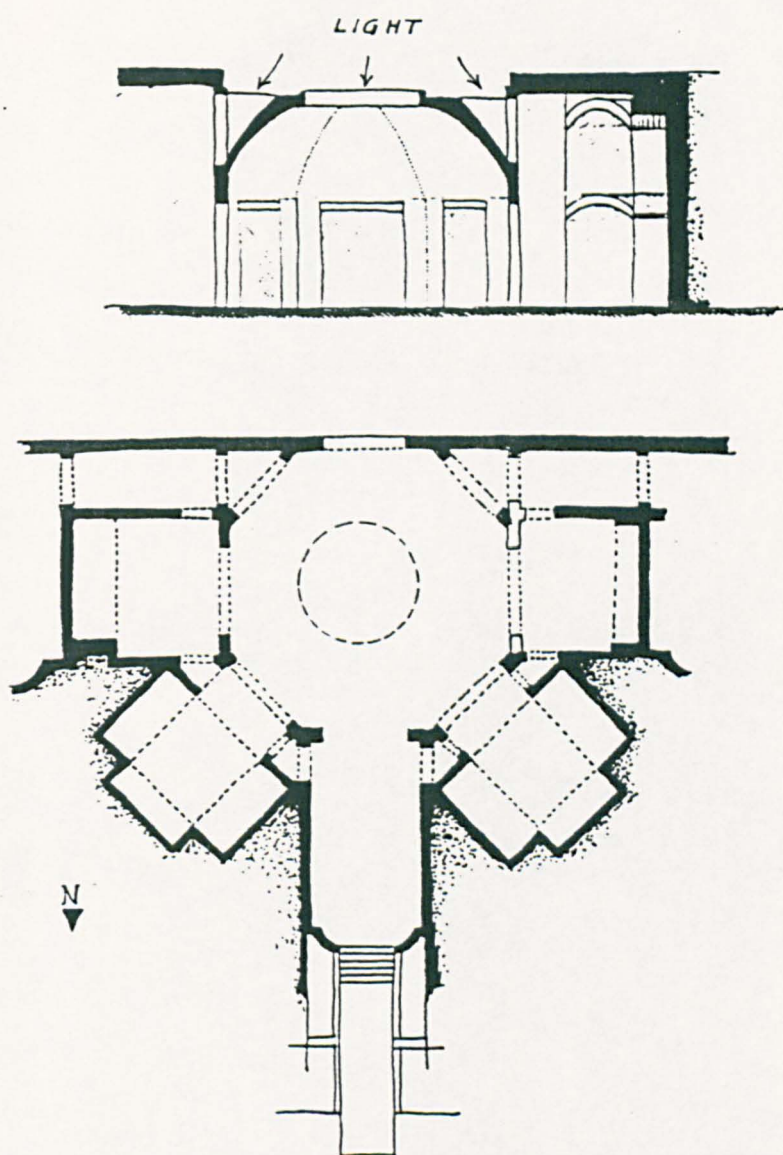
Nero's Golden House, Rome (A.D. 64-68), Section and Plan.
